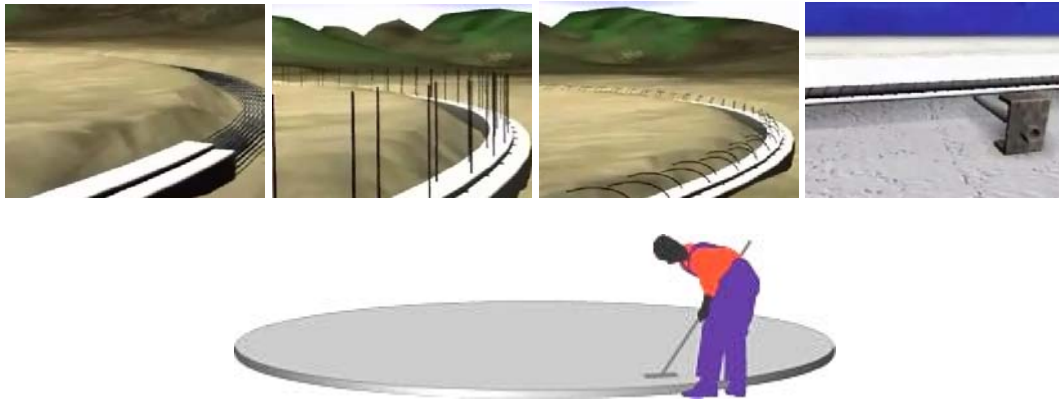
Building a Monolithic Dome. Step 1: Concrete ring foundation.
